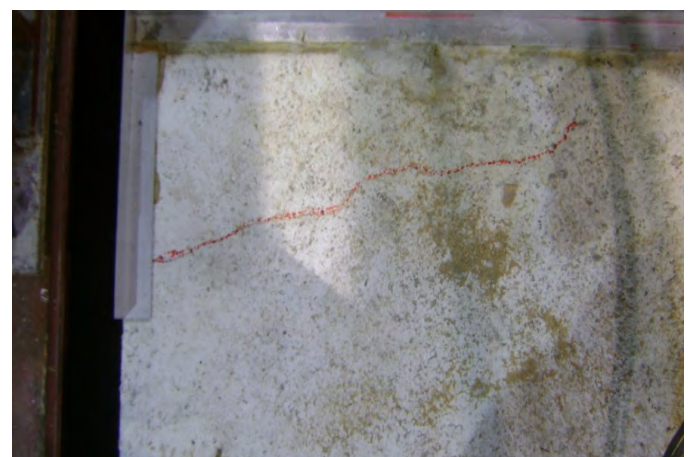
Exterior view of cracking at flange along northeast side of joint.
